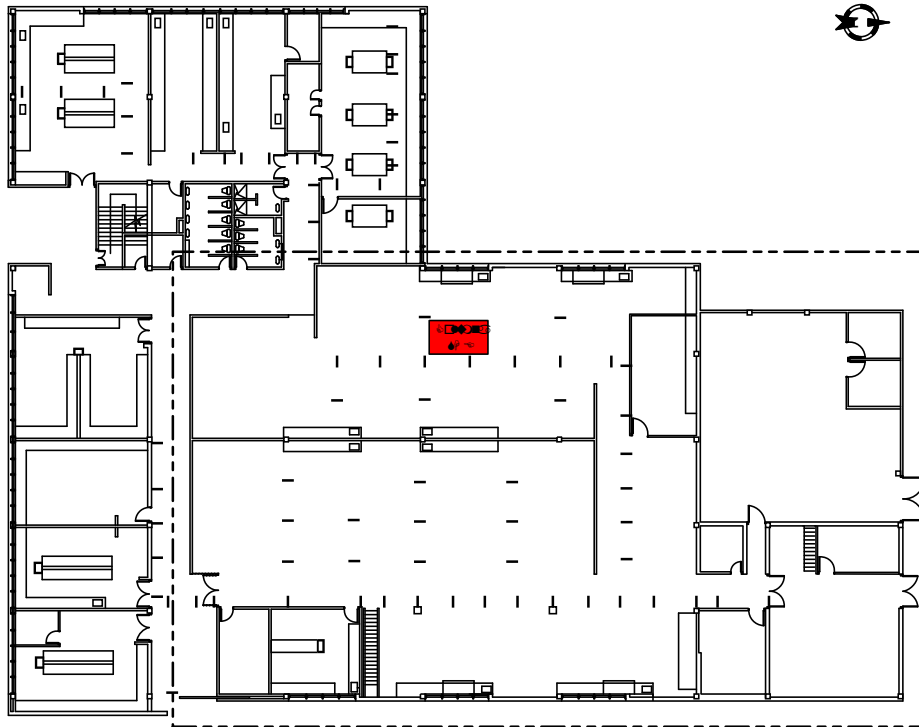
Plot plan of the Chemical Engineering Laboratory building 412
